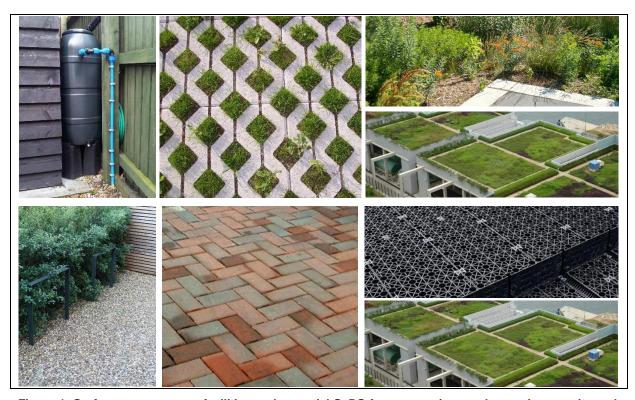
Surface water storage facilities and potential SuDS features - rainwater harvesting, on-site tank storage, rain garden soak-away and green roofs. (Source: UK SuDS Manual)
